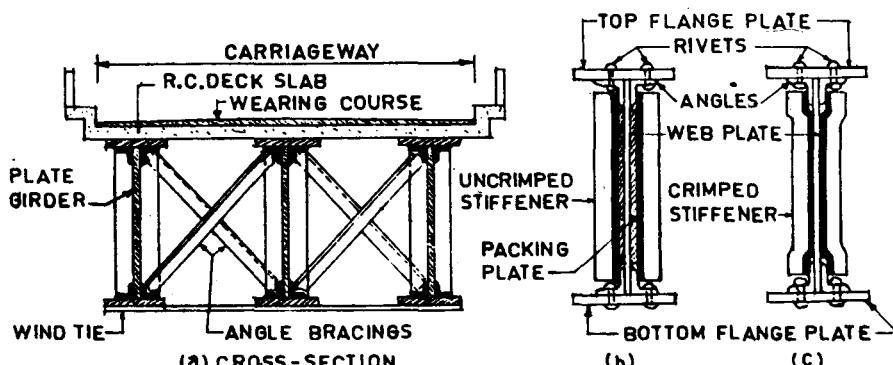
DETAILS OF PLATE GIRDER BRIDGE
